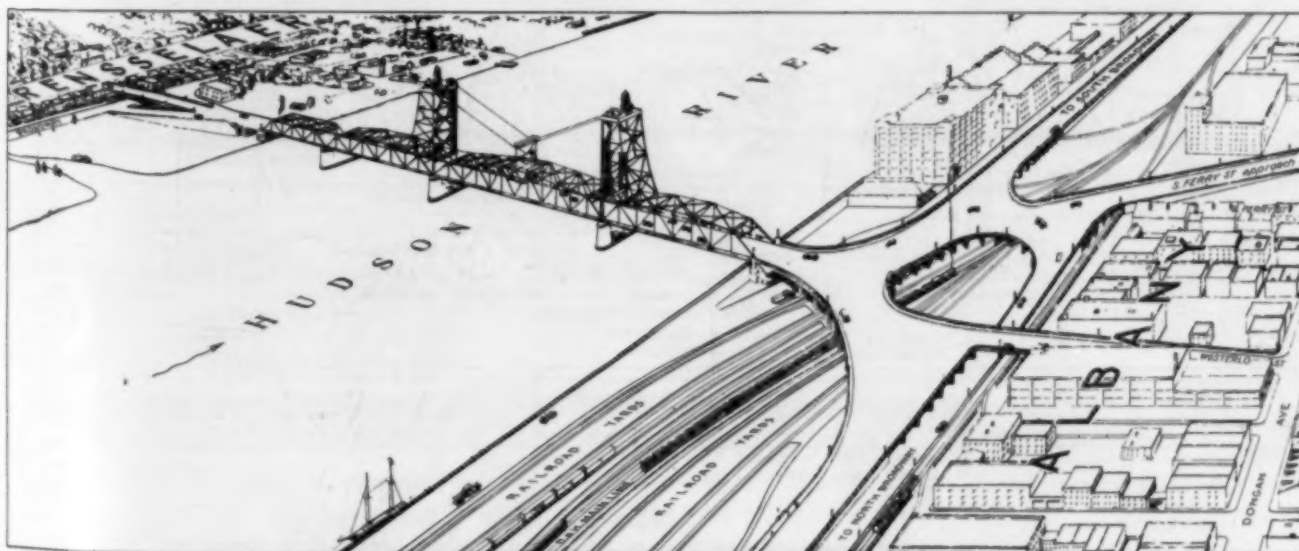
SITUATION SKETCH SHOWING BRIDGE AND APPROACHES
